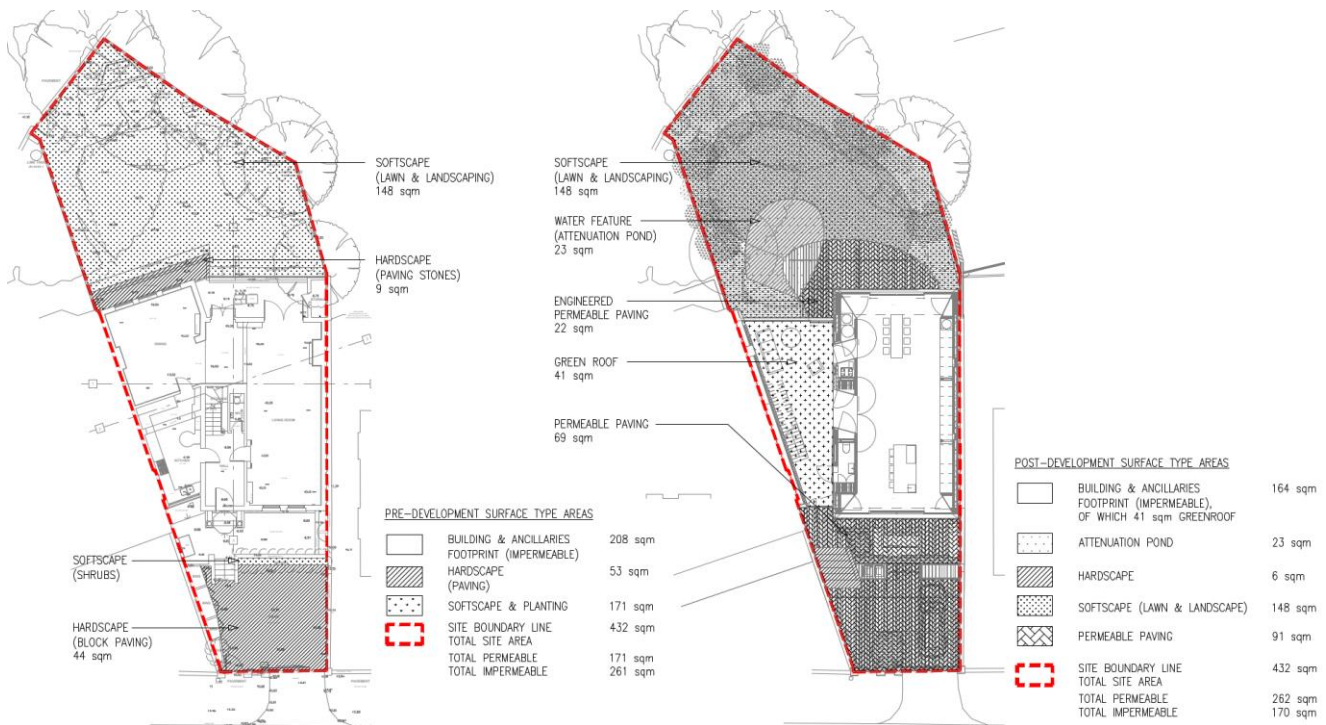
Pre- and Post-development surface-type areas (ground floor layouts)
